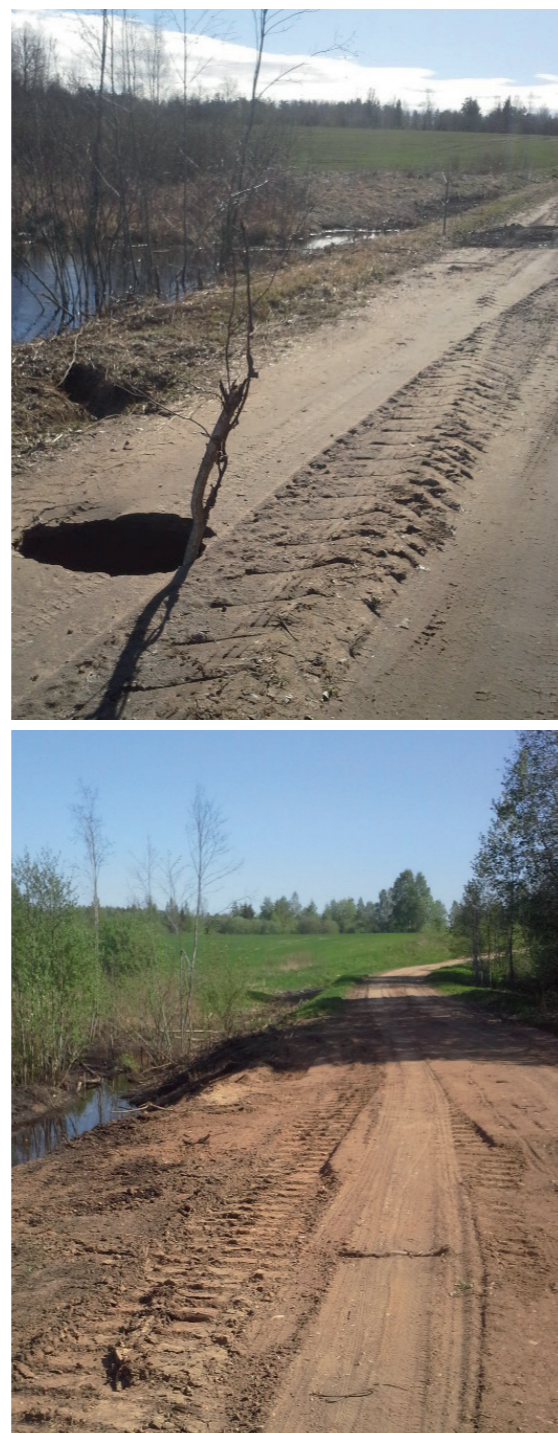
Beaver damage to a local public road (top) and the same place after road repair two weeks later.
